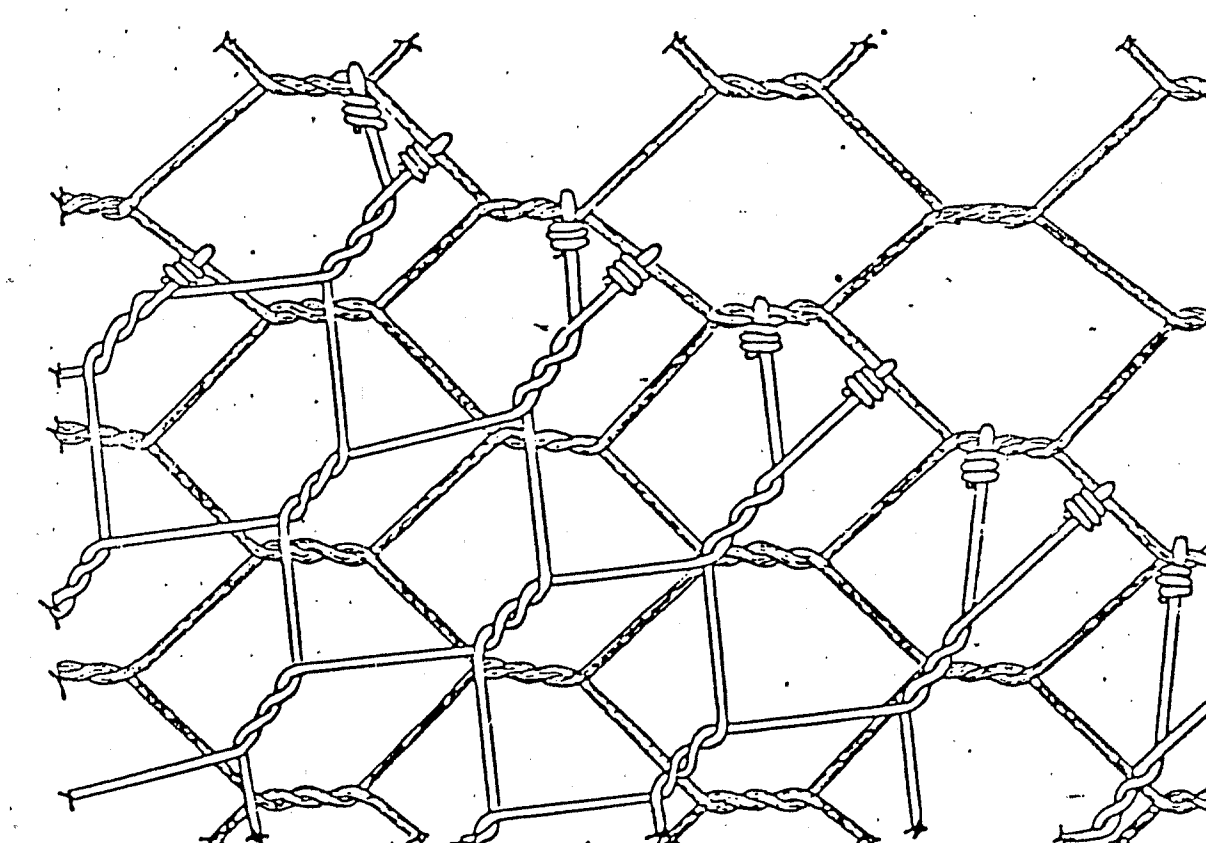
DETAIL OF WIRE FABRIC AND NORMAL SPLICE
